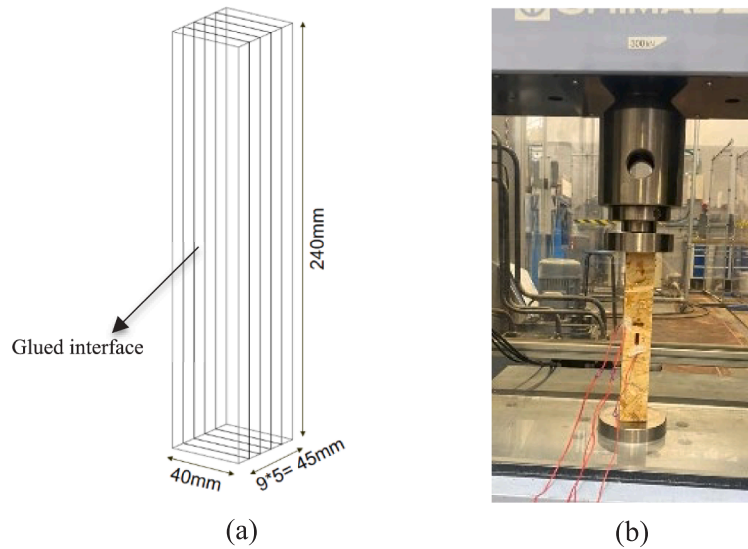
OSB compressive coupons: (a) dimensions in mm and (b) test set-up.
